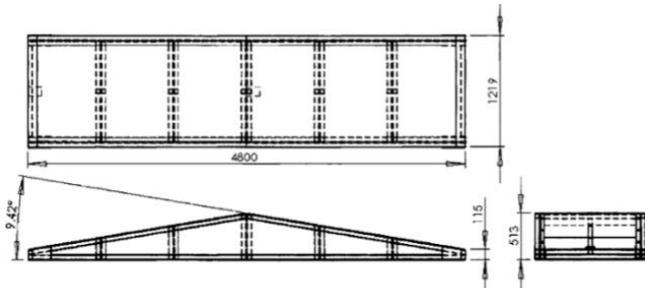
Top and elevation view of a roadway. Source: [15].
